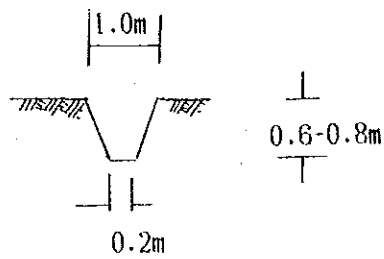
Section of Existing Drainage Canals in Sara Zone
